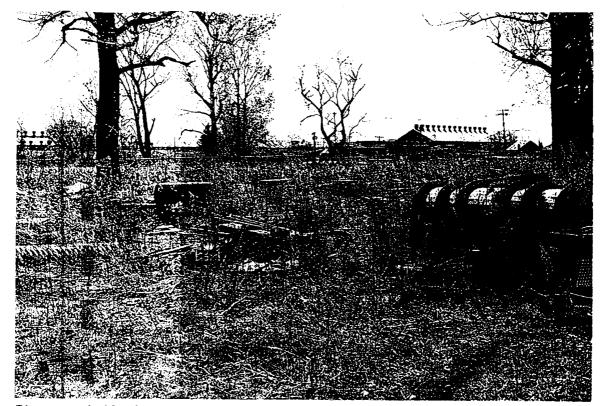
Access road south side of fenced area facing east. Note soil and asphalt debris piles and Buffalo Brake Beam facility. (Peter Gorton, April 1998.)
